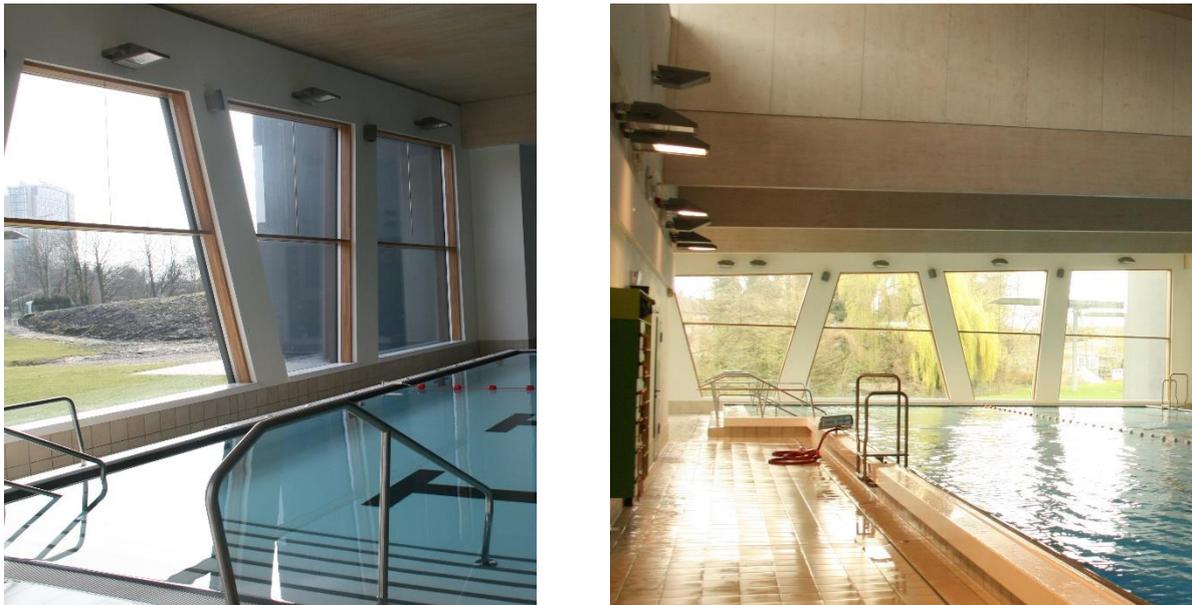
Lippe-Bad, raised top of the pool allows a parapet to be implemented for the curtain wall façade without impairing visual connection of the swimmers towards the outside.
